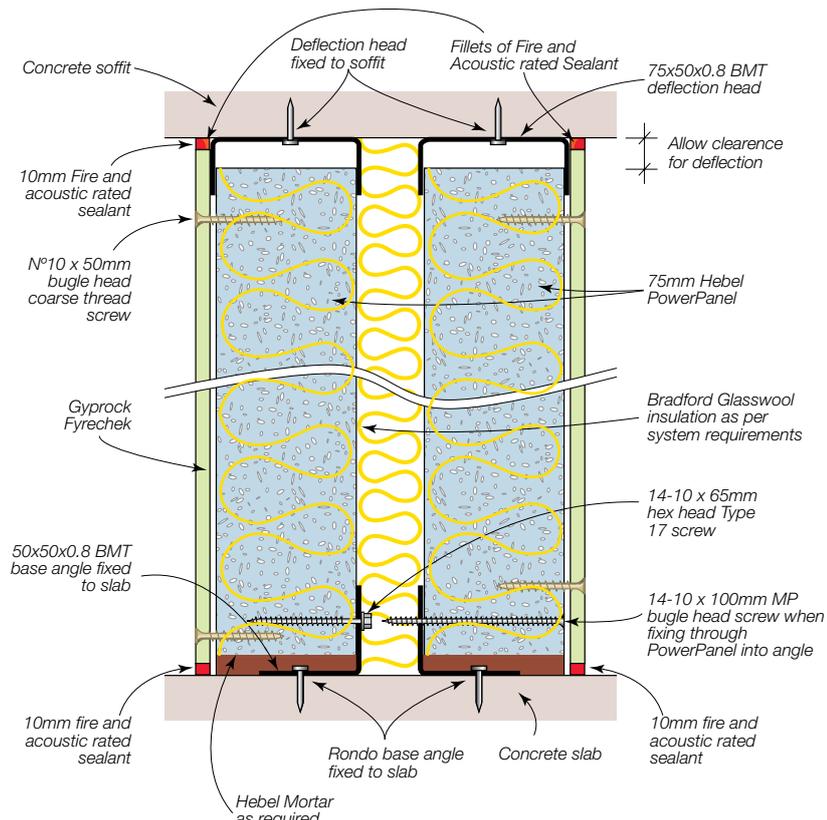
Intertency Wall / Common Wall Option 3 - Vertical cross section detail
